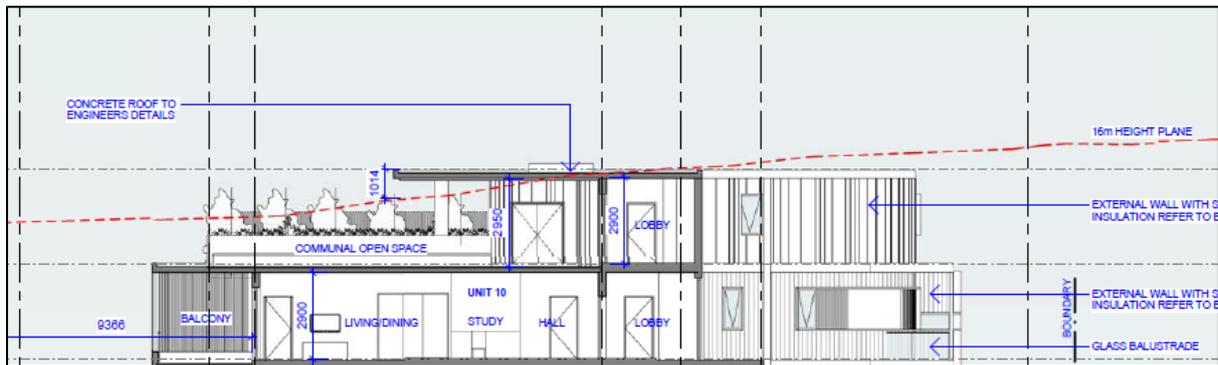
extract of building section illustrating those components of the building which breach the 16m height plane.
